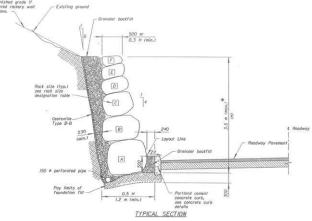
Rockery Wall Example and Typical Schematic Detail. Detail Courtesy of Federal Highway Administration
